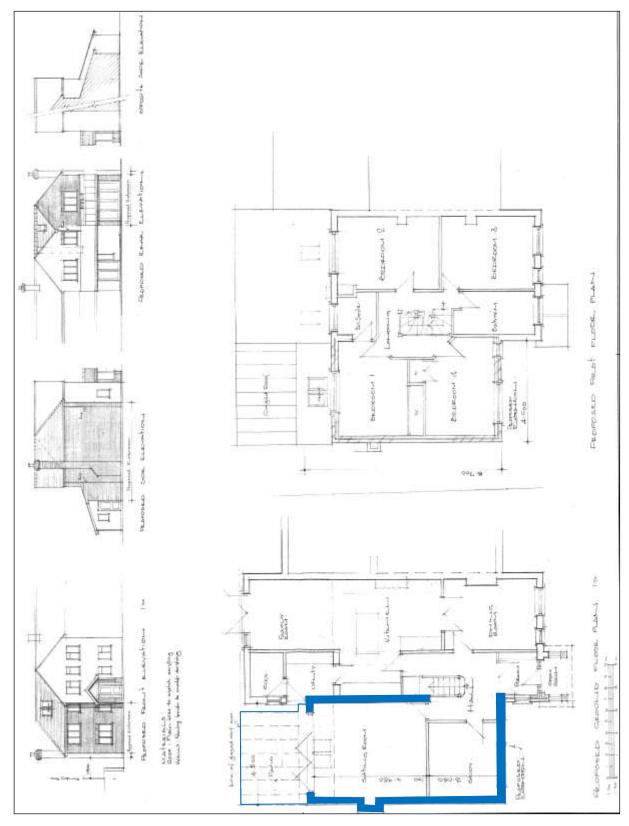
Proposed development, ground floor of extension highlighted (not to scale)
